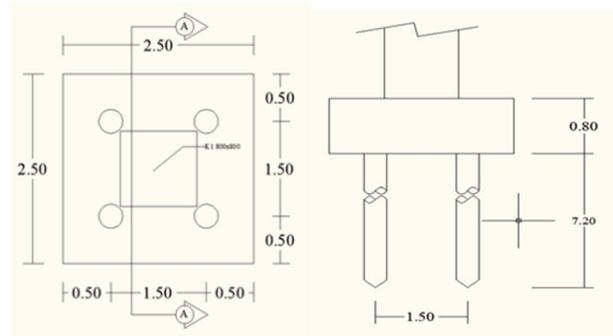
Pile cap plan Fig. 8. A-A pile cap section
